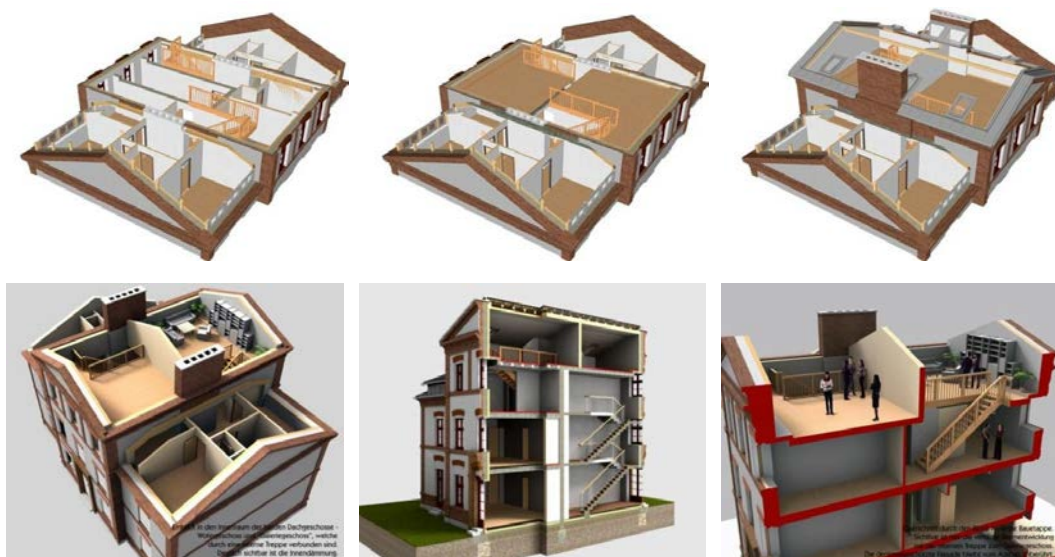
new interior layout. (Wohnhaussanierung "Tschechenring", 2008, pp 48)
